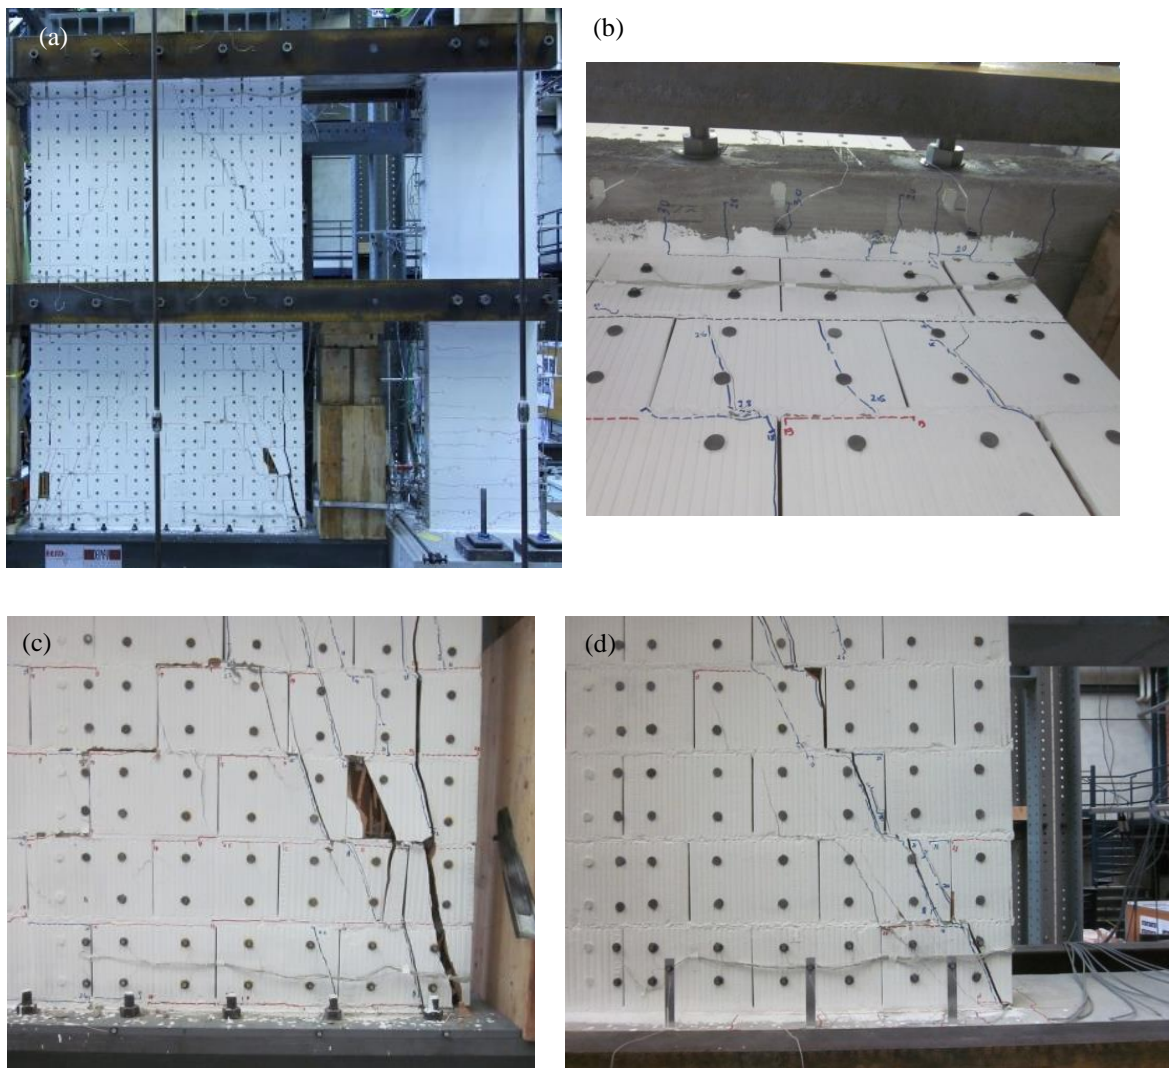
Crack pattern at LS31, $\delta = +0.6\%$. (a) specimen; (b) RC first storey beam, curvature penetration into the URM wall; (c, d): compressed corner of the first and second storey of the URM wall.
